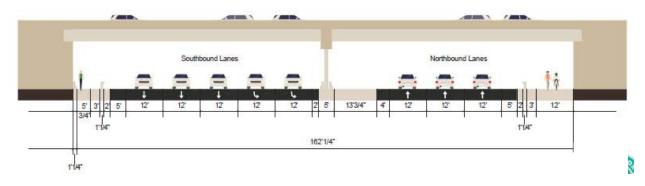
SR 535 under Osceola Parkway Bridge – Proposed
